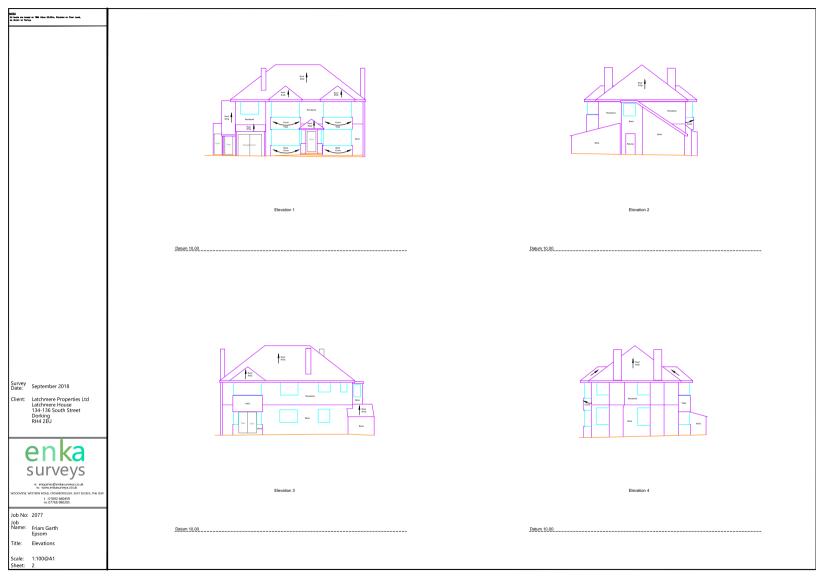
Elevation plans of the existing building. Image courtesy of enka surveys
